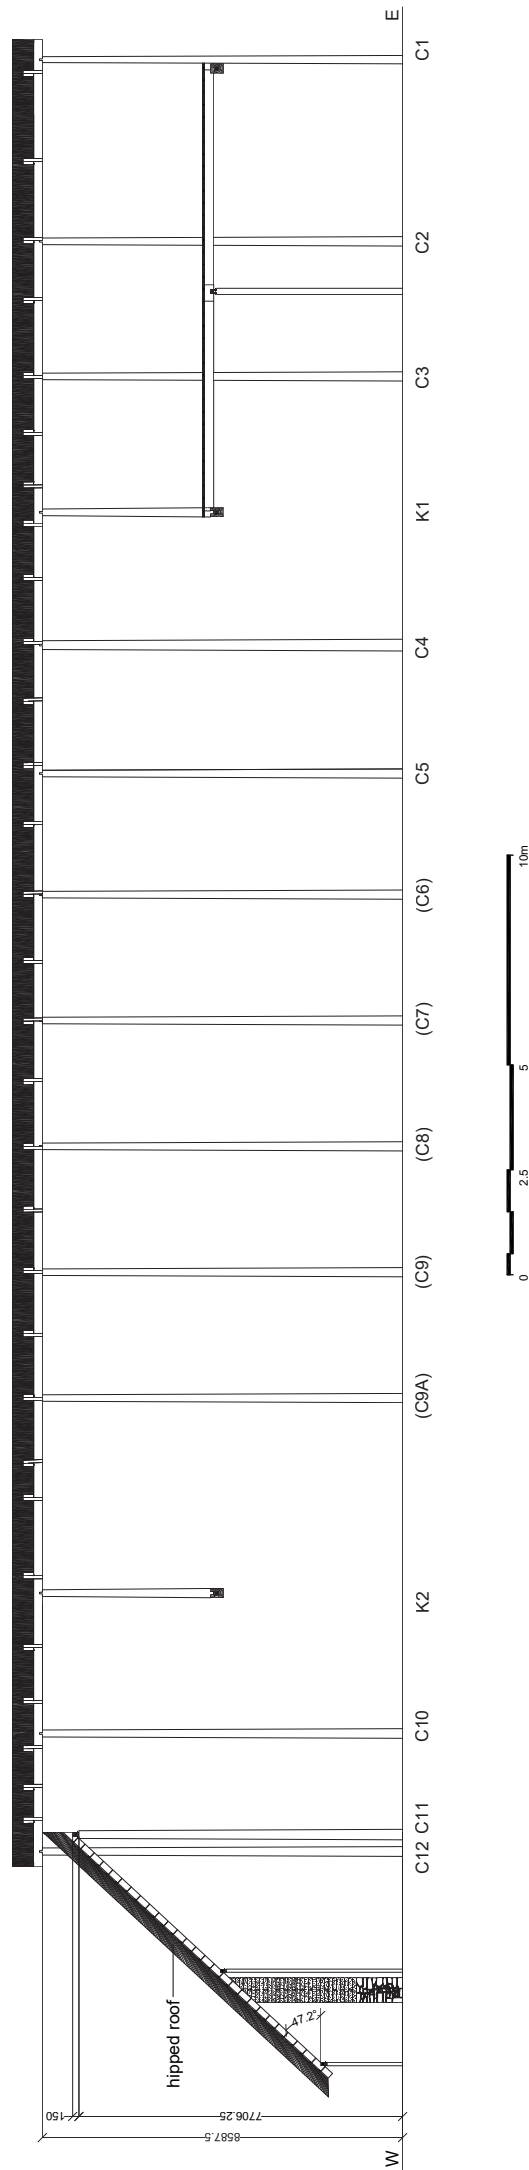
Idealised reconstruction of a cross-section along the building, south of its longitudinal axis. The post pits have been omitted.
